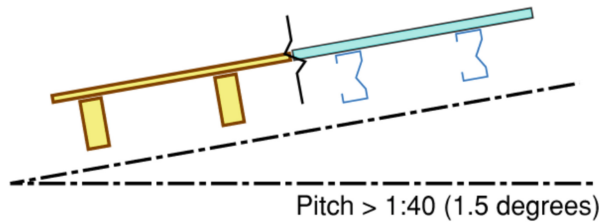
Where the structural roof deck pitch was less than 10° but greater than 1.5 a sheathed timber joist deck was deemed acceptable
